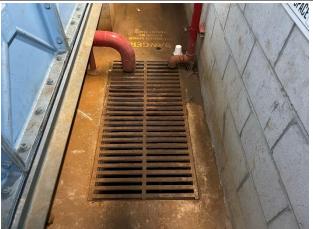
Level B1, Sprinkler Pump Room – sump pump pit.
